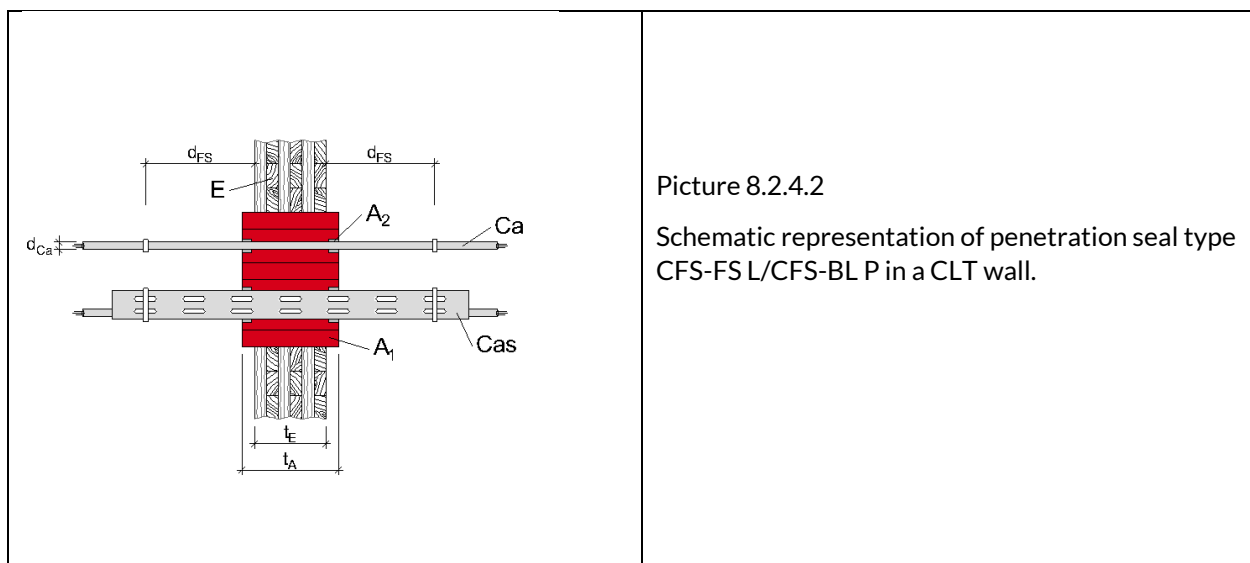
cable penetration applications through CFS-FS L or CFS-BL P seal trough a timber wall construction
